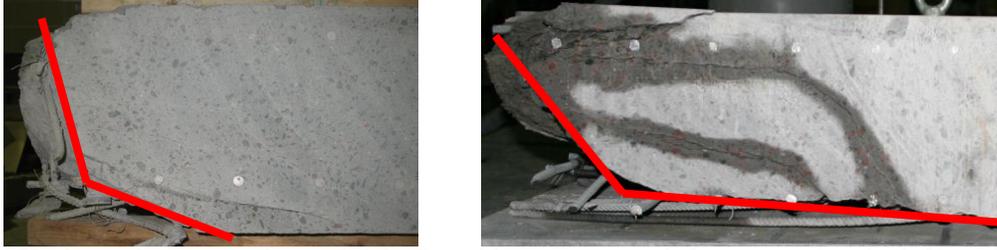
Horizontal cross sections of slabs P6 with transverse reinforcement (on the left) and IRIS P2 without transverse reinforcement (on the right)
